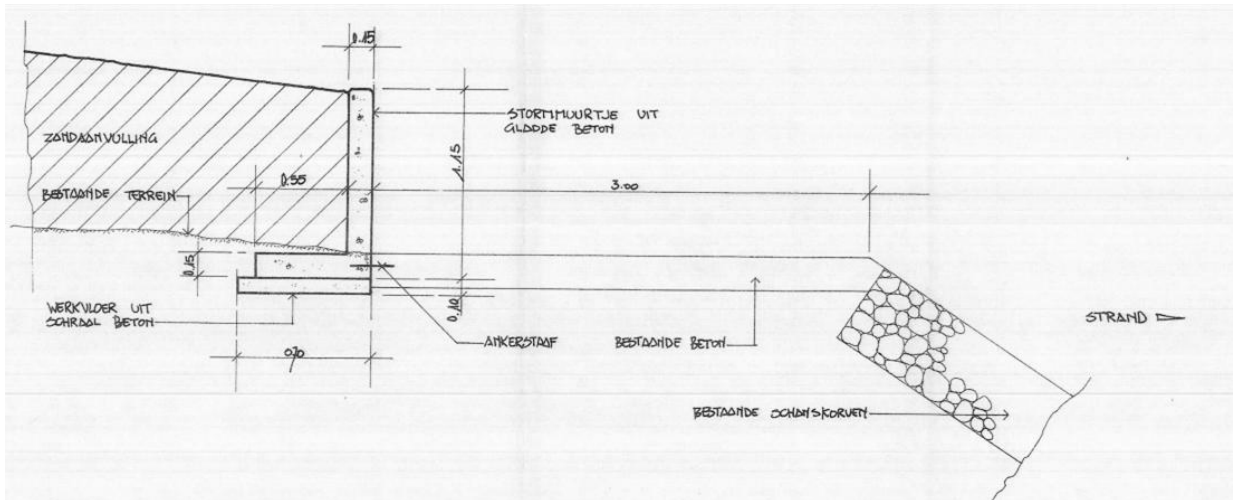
Sketch, cross-section of concrete seawall (dune reinforcement + small retaining wall) at De Panne (start of construction of small retaining wall, 1993).
